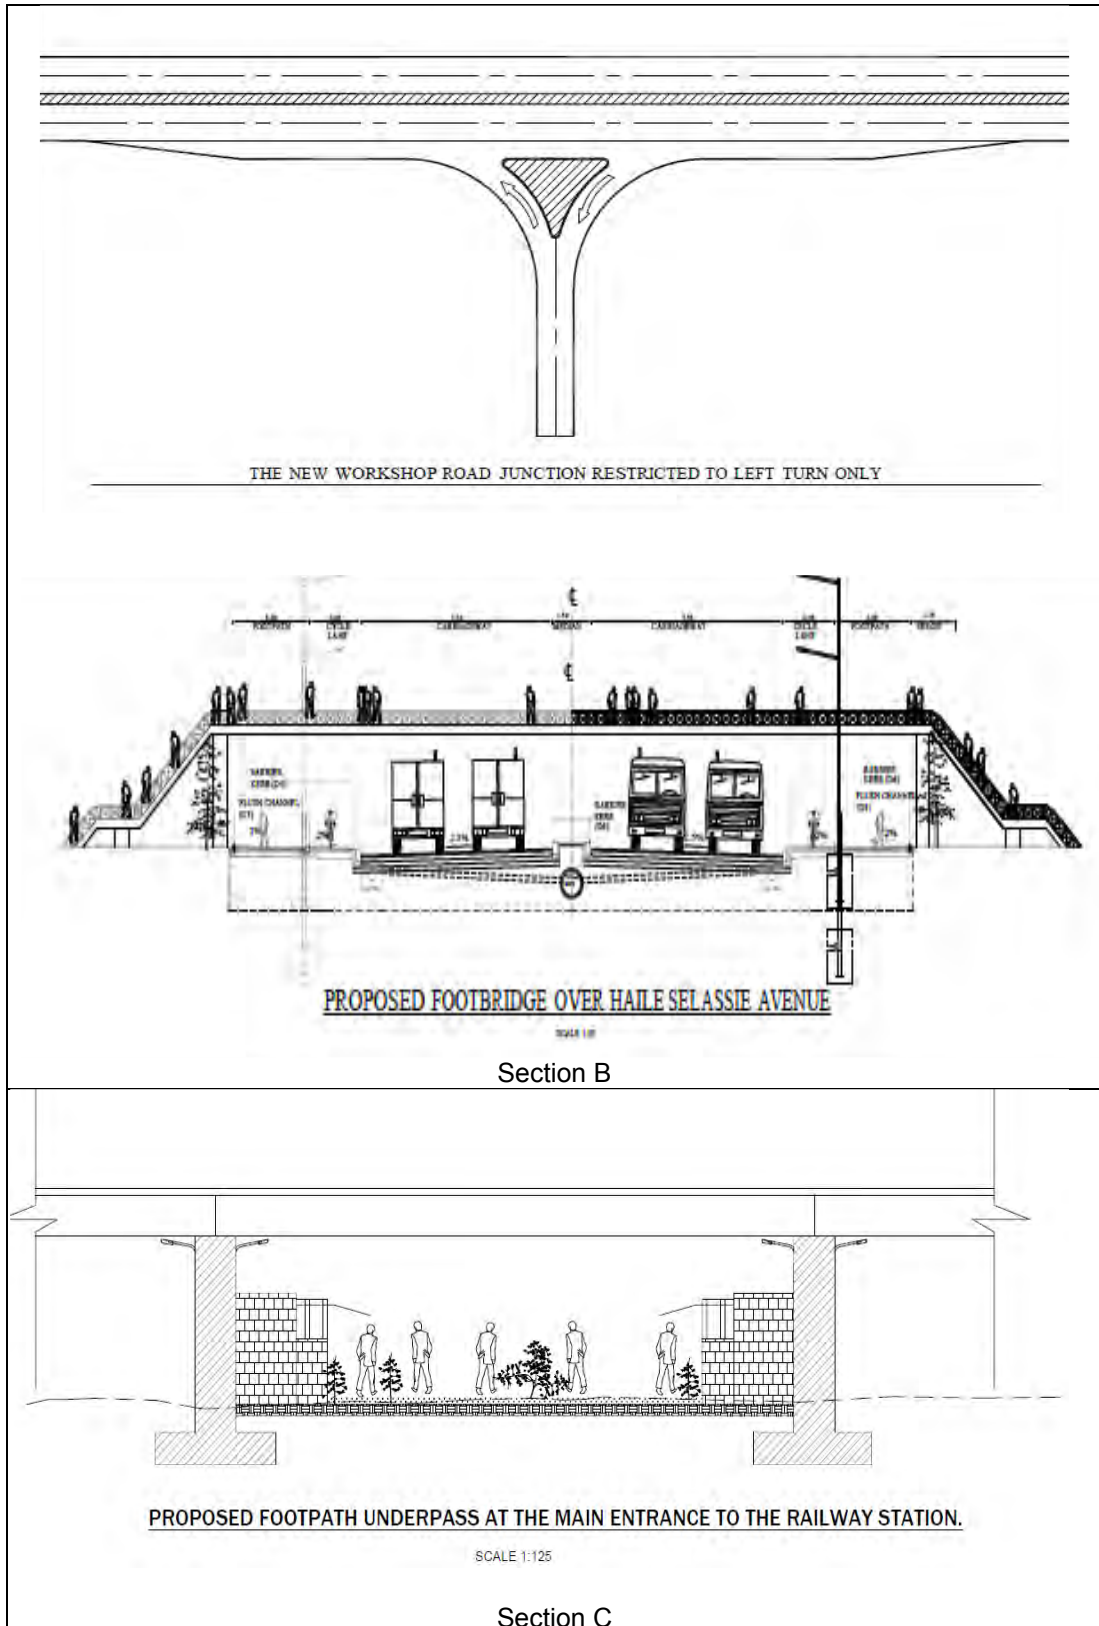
Idea Sketches for Linkage between Existing CBD and the Planning Area
